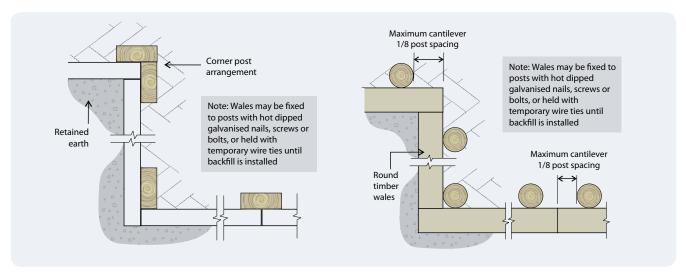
(b): Sleeper Post Arrangement (Outside Wall) Figure 3.5 (c): Round Post Arrangement (Inside Wall)
